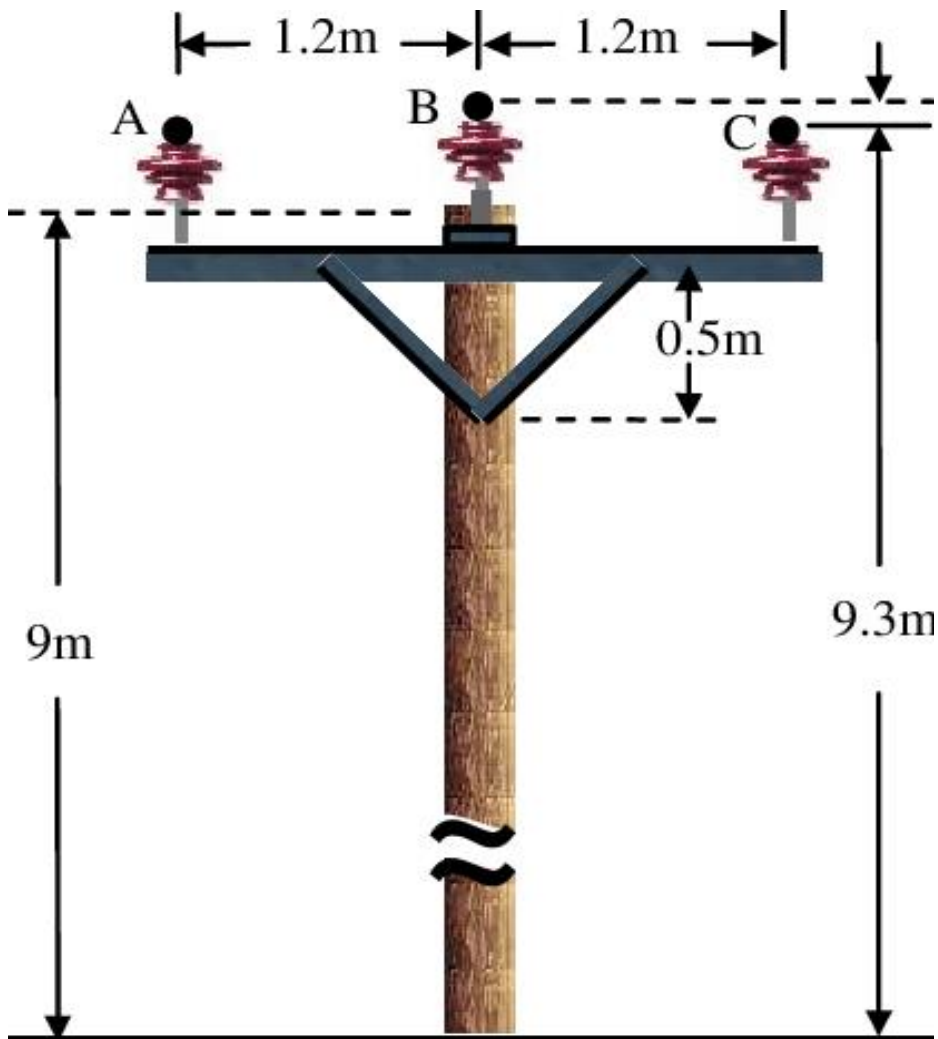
Dimensions of a Typical High-Tension Dressed Pole
